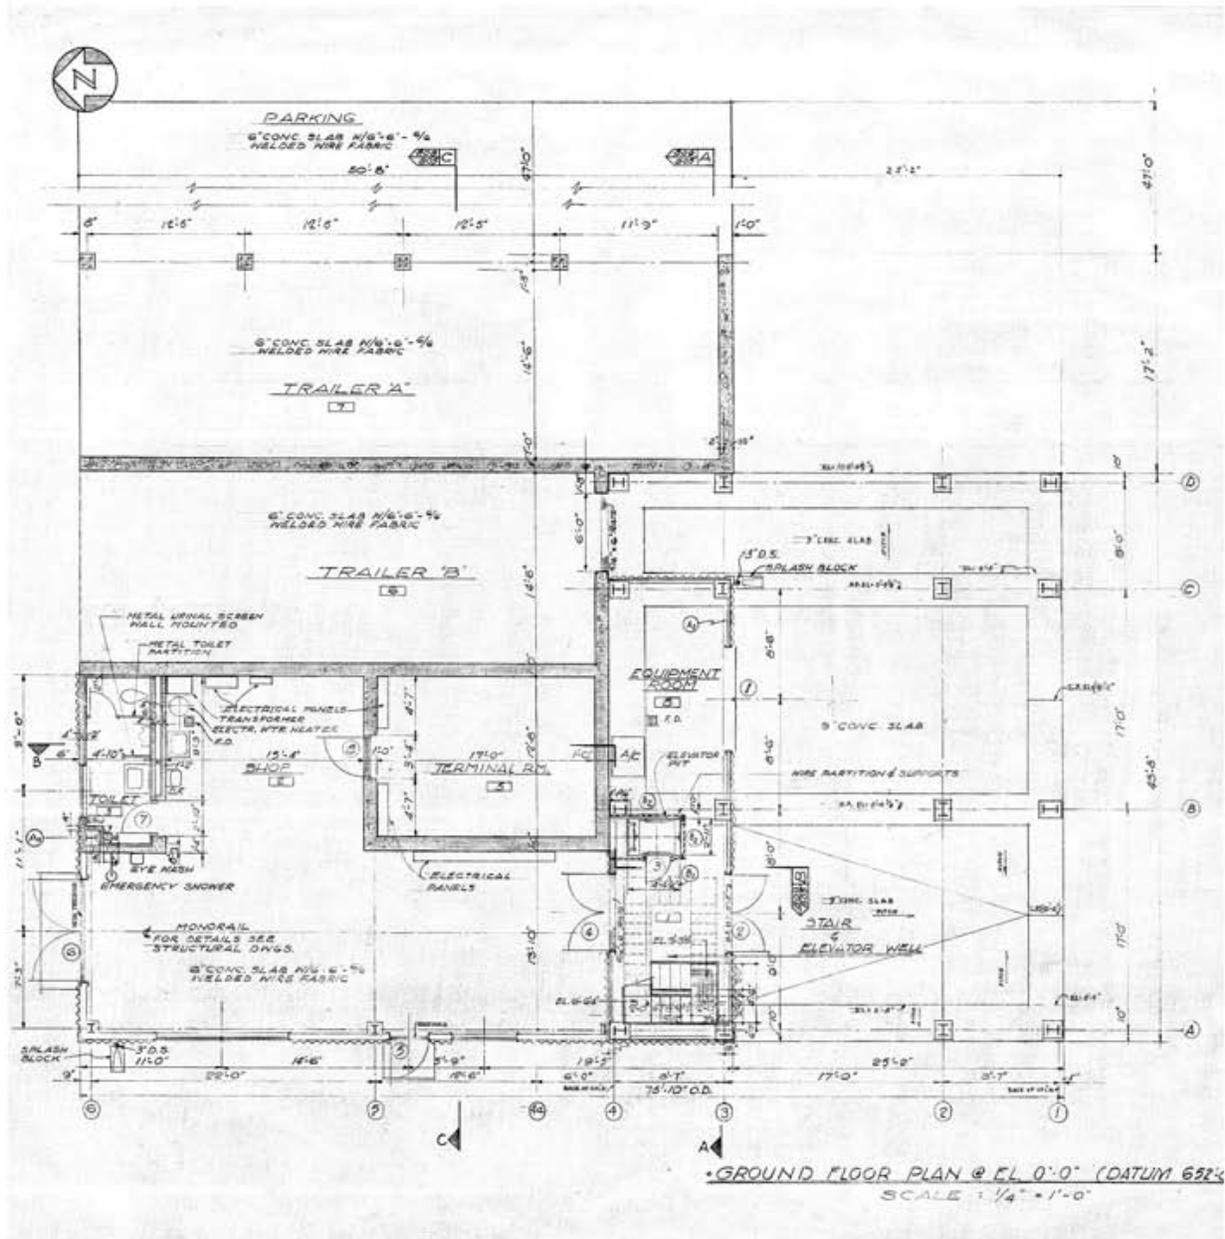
Architectural drawing of B-1 ground floor, shop area, and trailer storage, 1960 (PF-20451, NASA Glenn).
